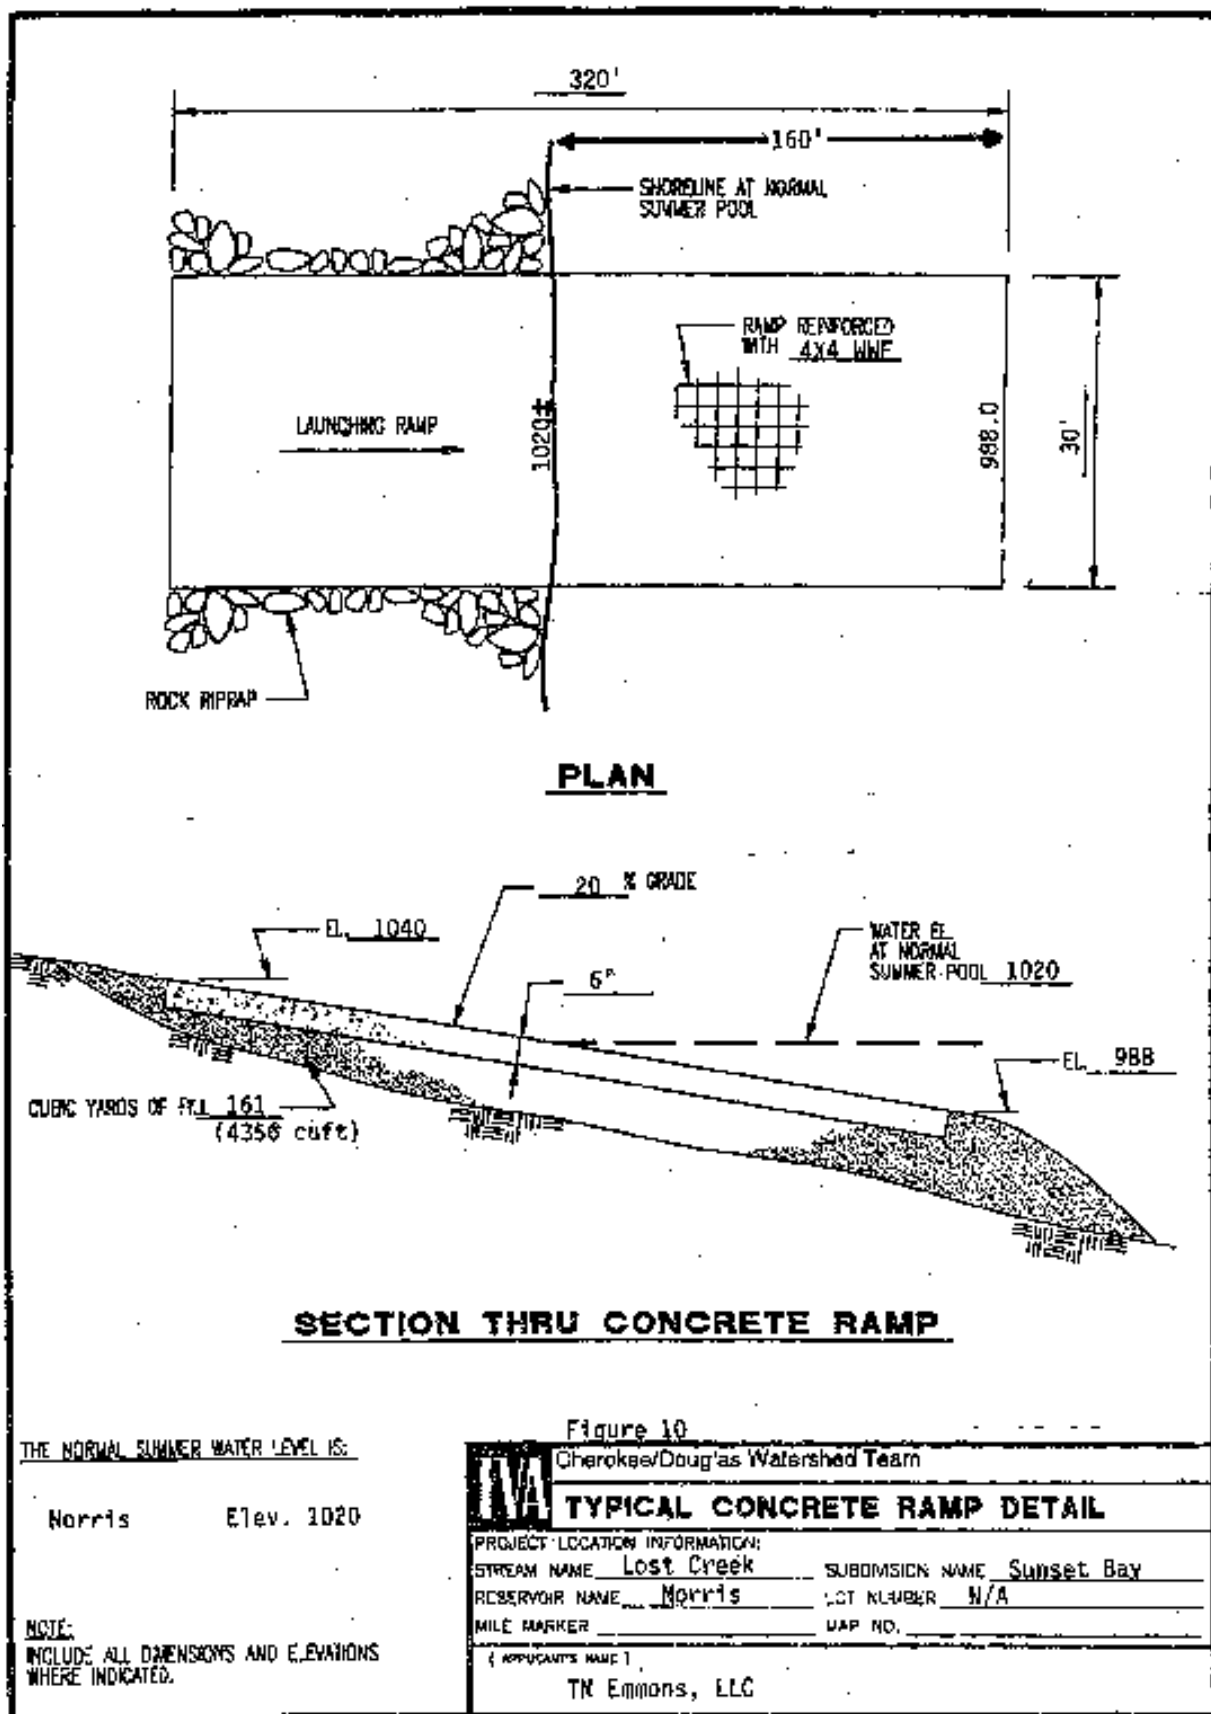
Sunset Bay Typical Concrete Ramp Detail
